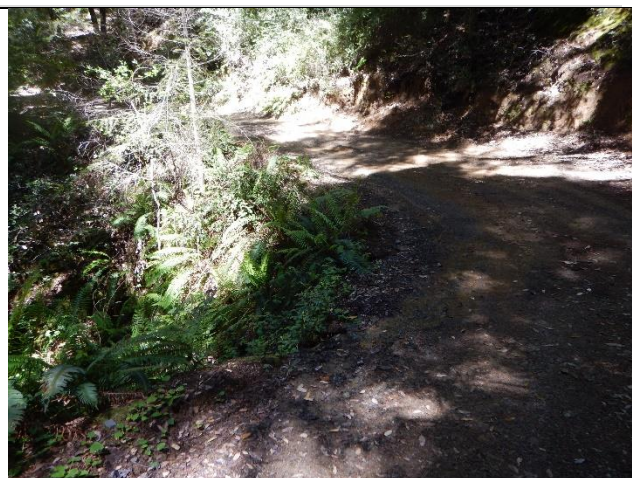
Culvert 3; road runoff entering watercourse at Culvert 3 outlet
